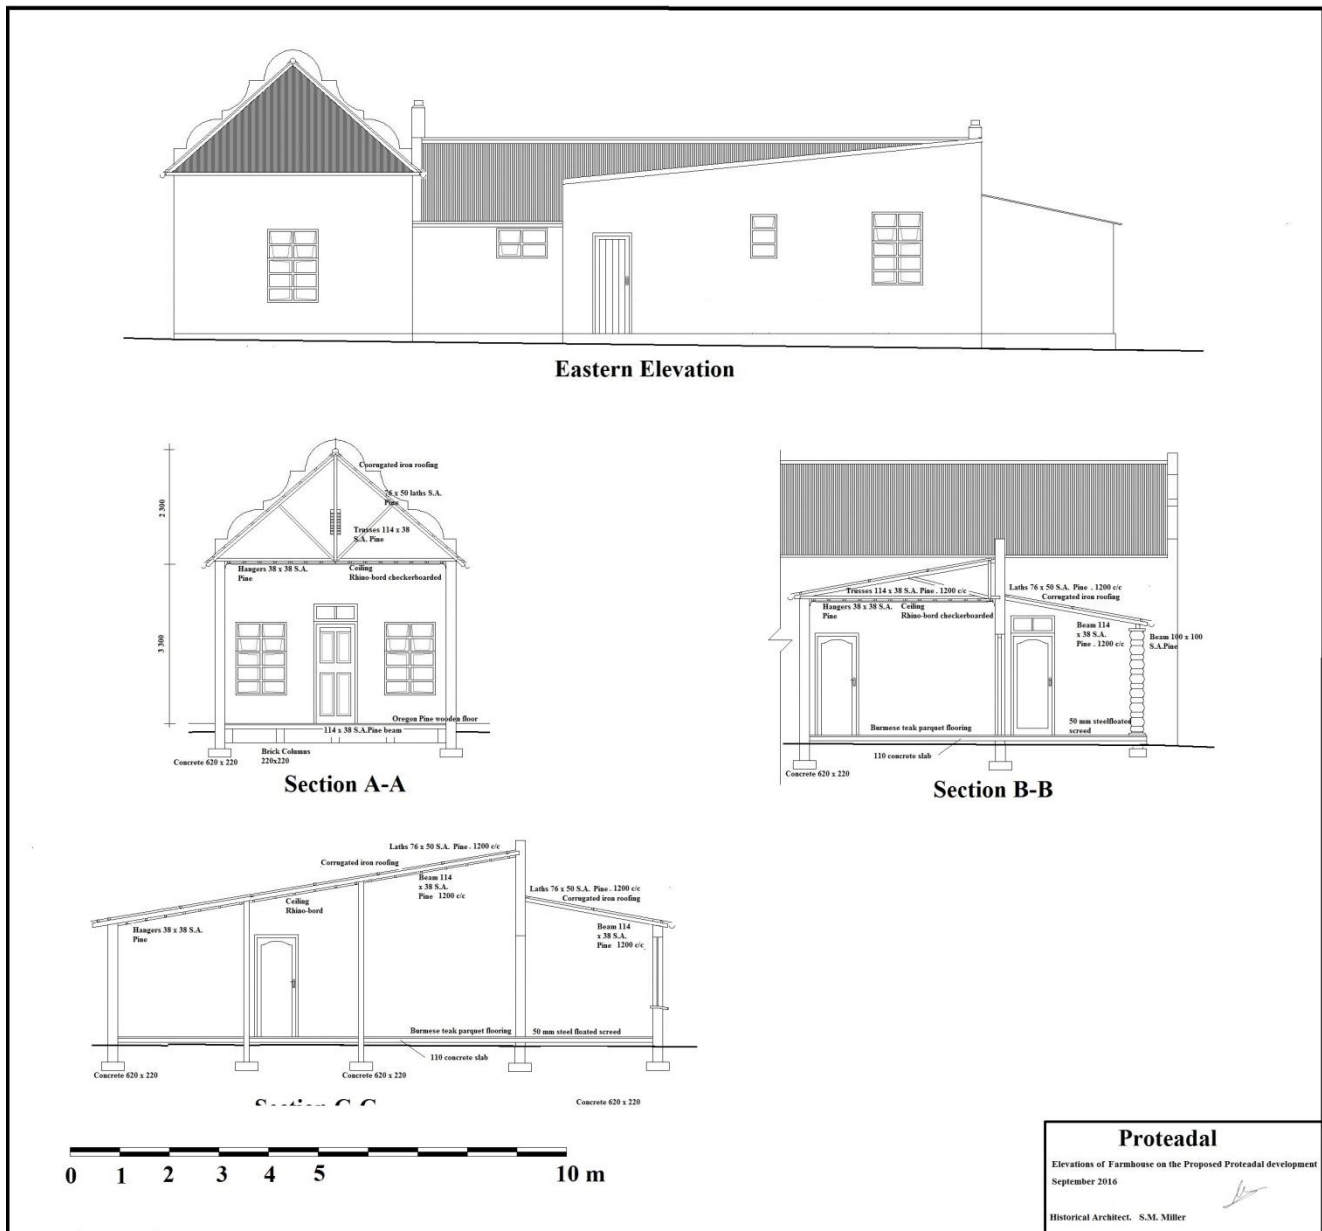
Sections of the dwelling as recorded in 2016. (Drawing S.M. Miller.)²²
